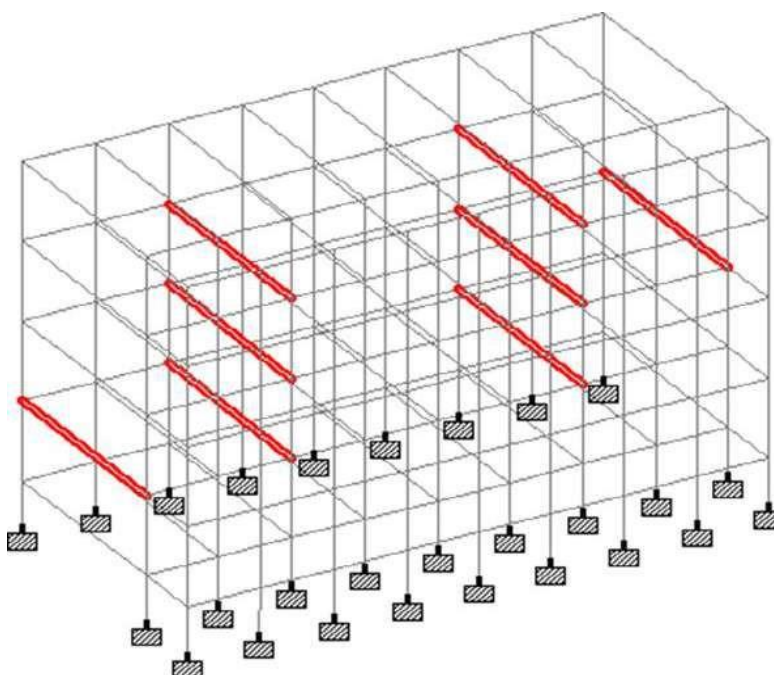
BEAMS FAILING IN SHEAR CAPACITY
